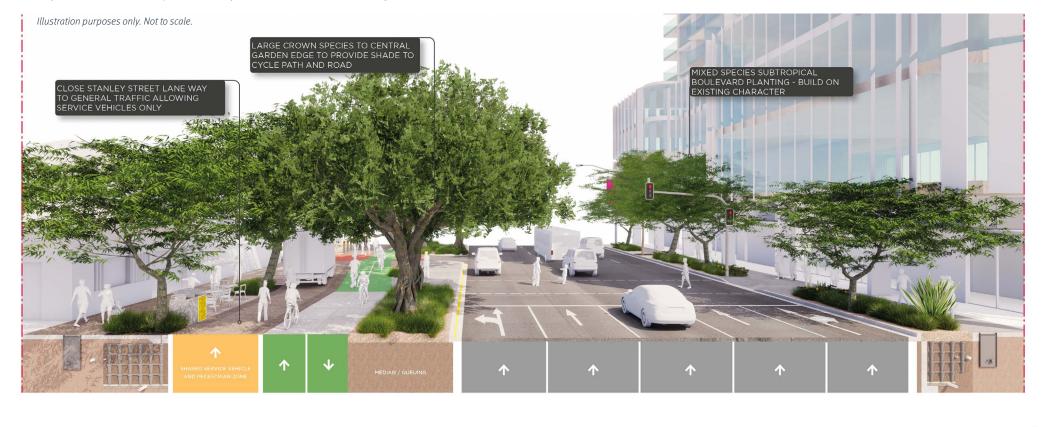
Cross section - Stanley Street - Precinct 1 - subtropical boulevard (major)
